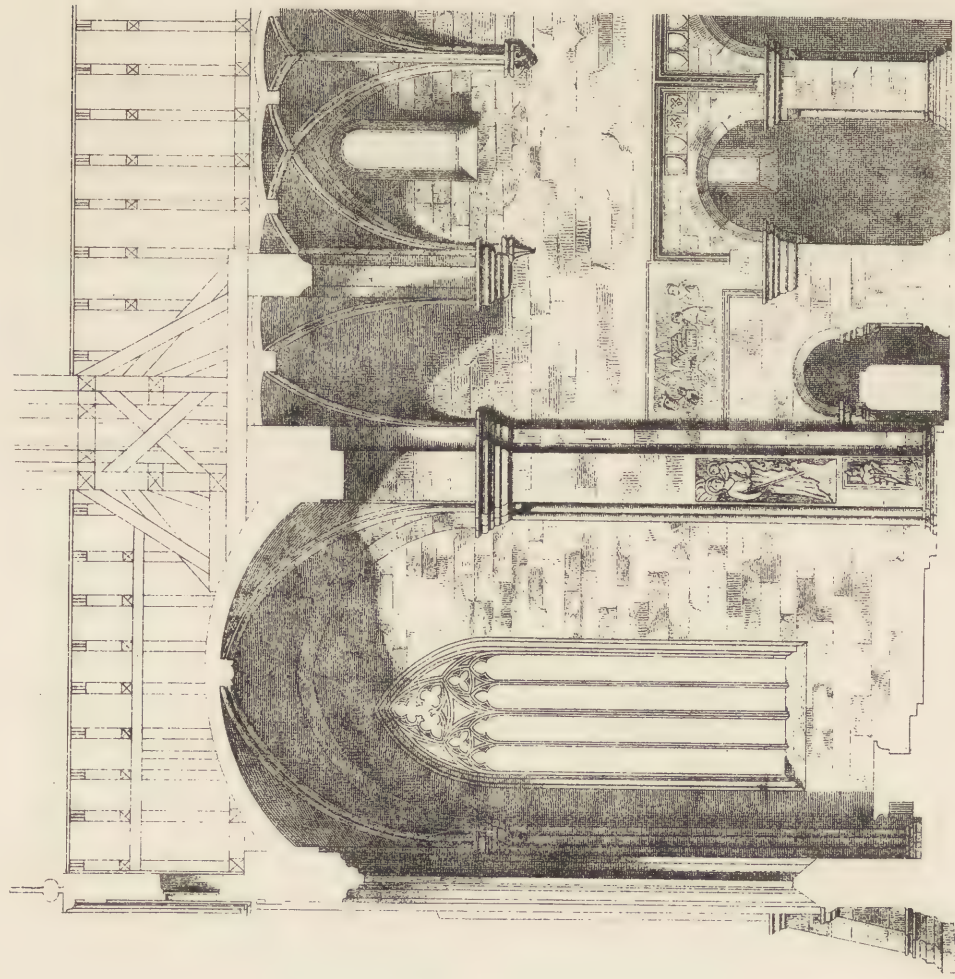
LONGITUDINAL SECTION THROUGH EAST END OF CHURCH.
